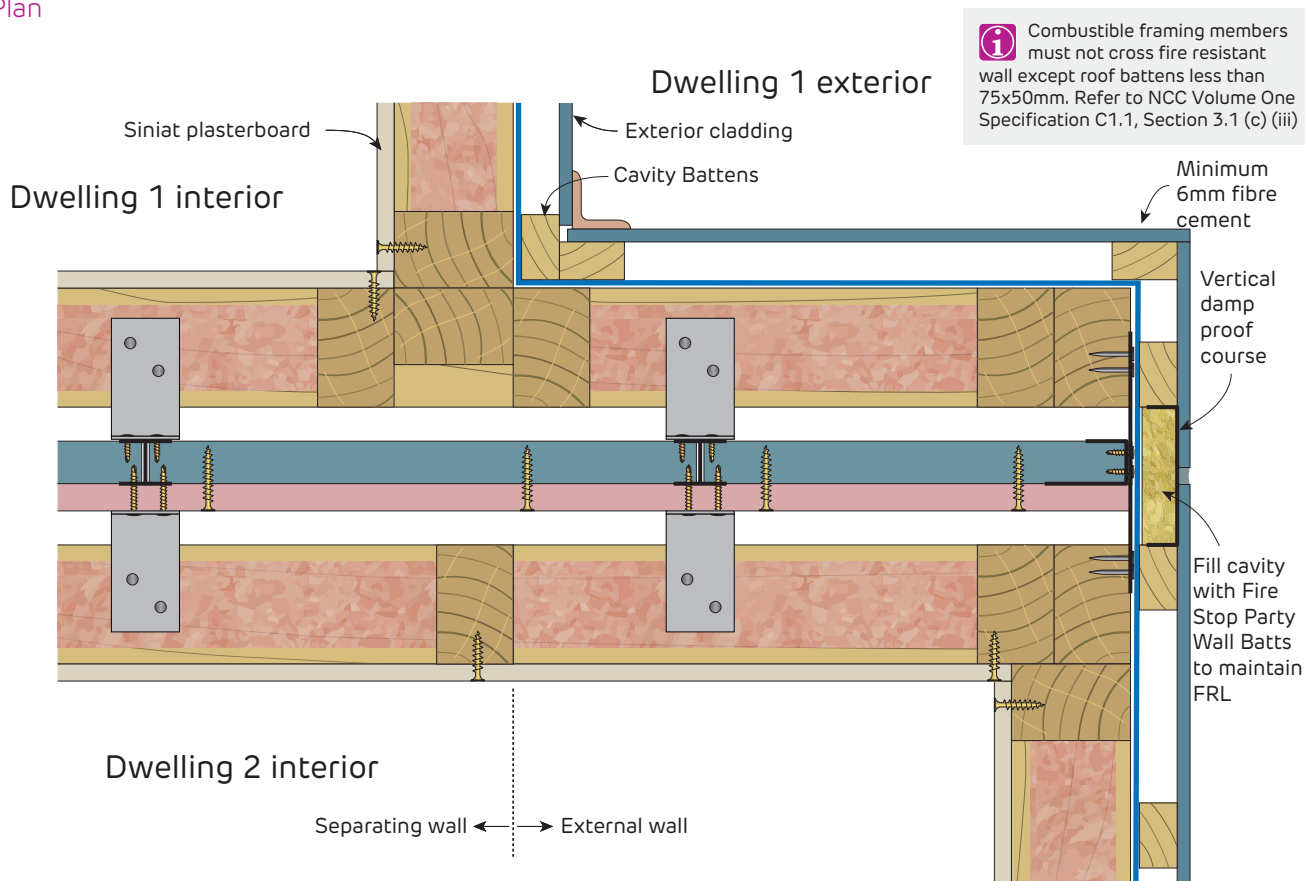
Interhome Wall to External Clad Wall with Cavity Battens
